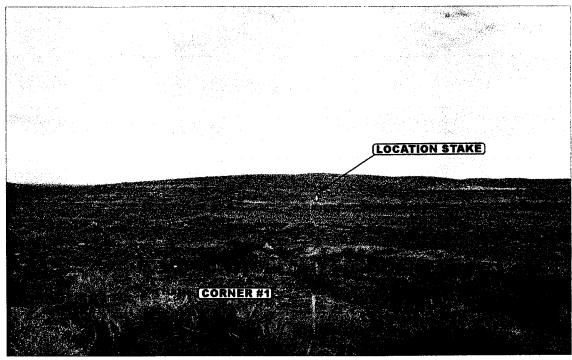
PHOTO: VIEW FROM CORNER #1 TO LOCATION STAKE
